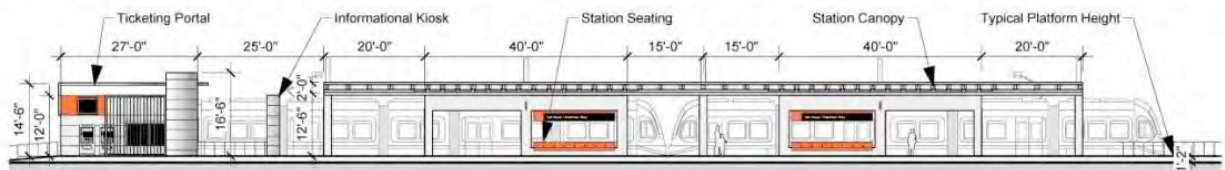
Illustrative Design Details for Low-Floor LRT/Tram Alternative
